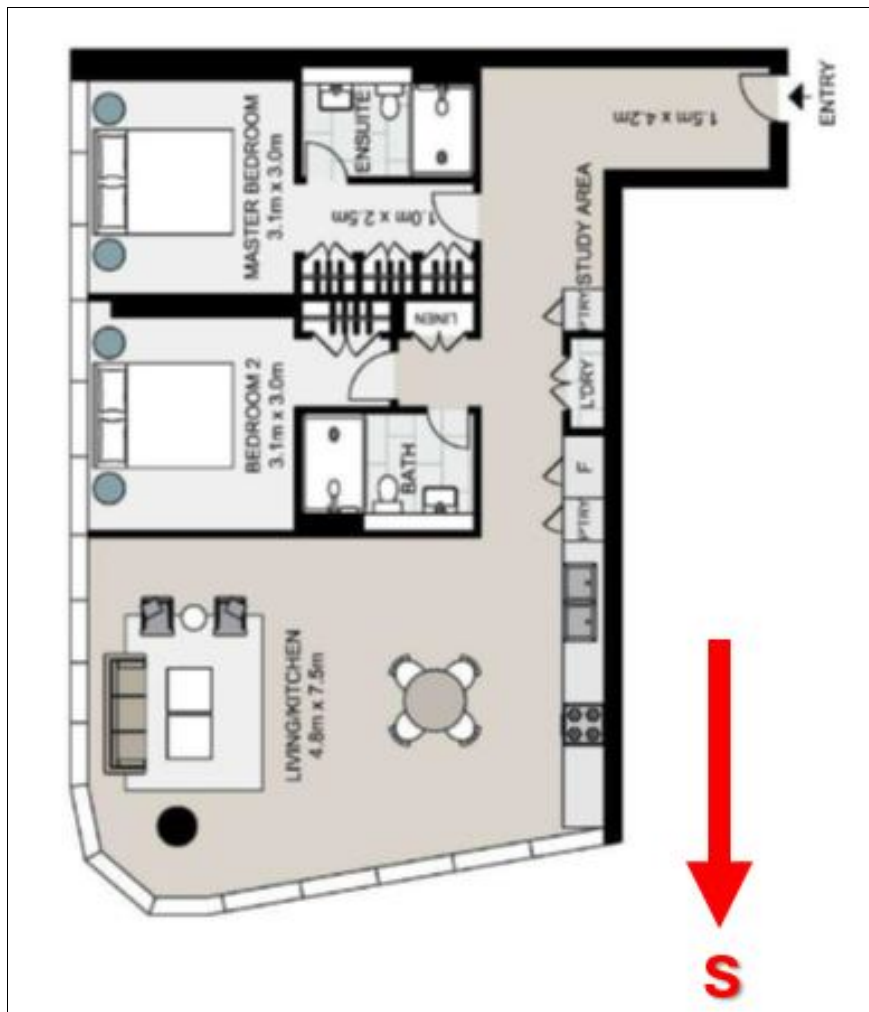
Floor plan of Level 11 unit (1103) 1 Marshall Avenue. (Source Domain)
